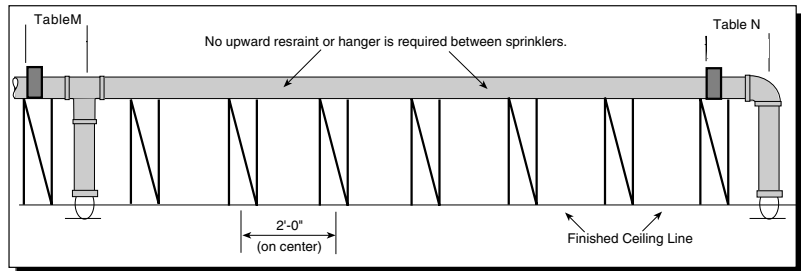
Fig. Q • Sprinkler Drop Pipe Adjacent to Truss
